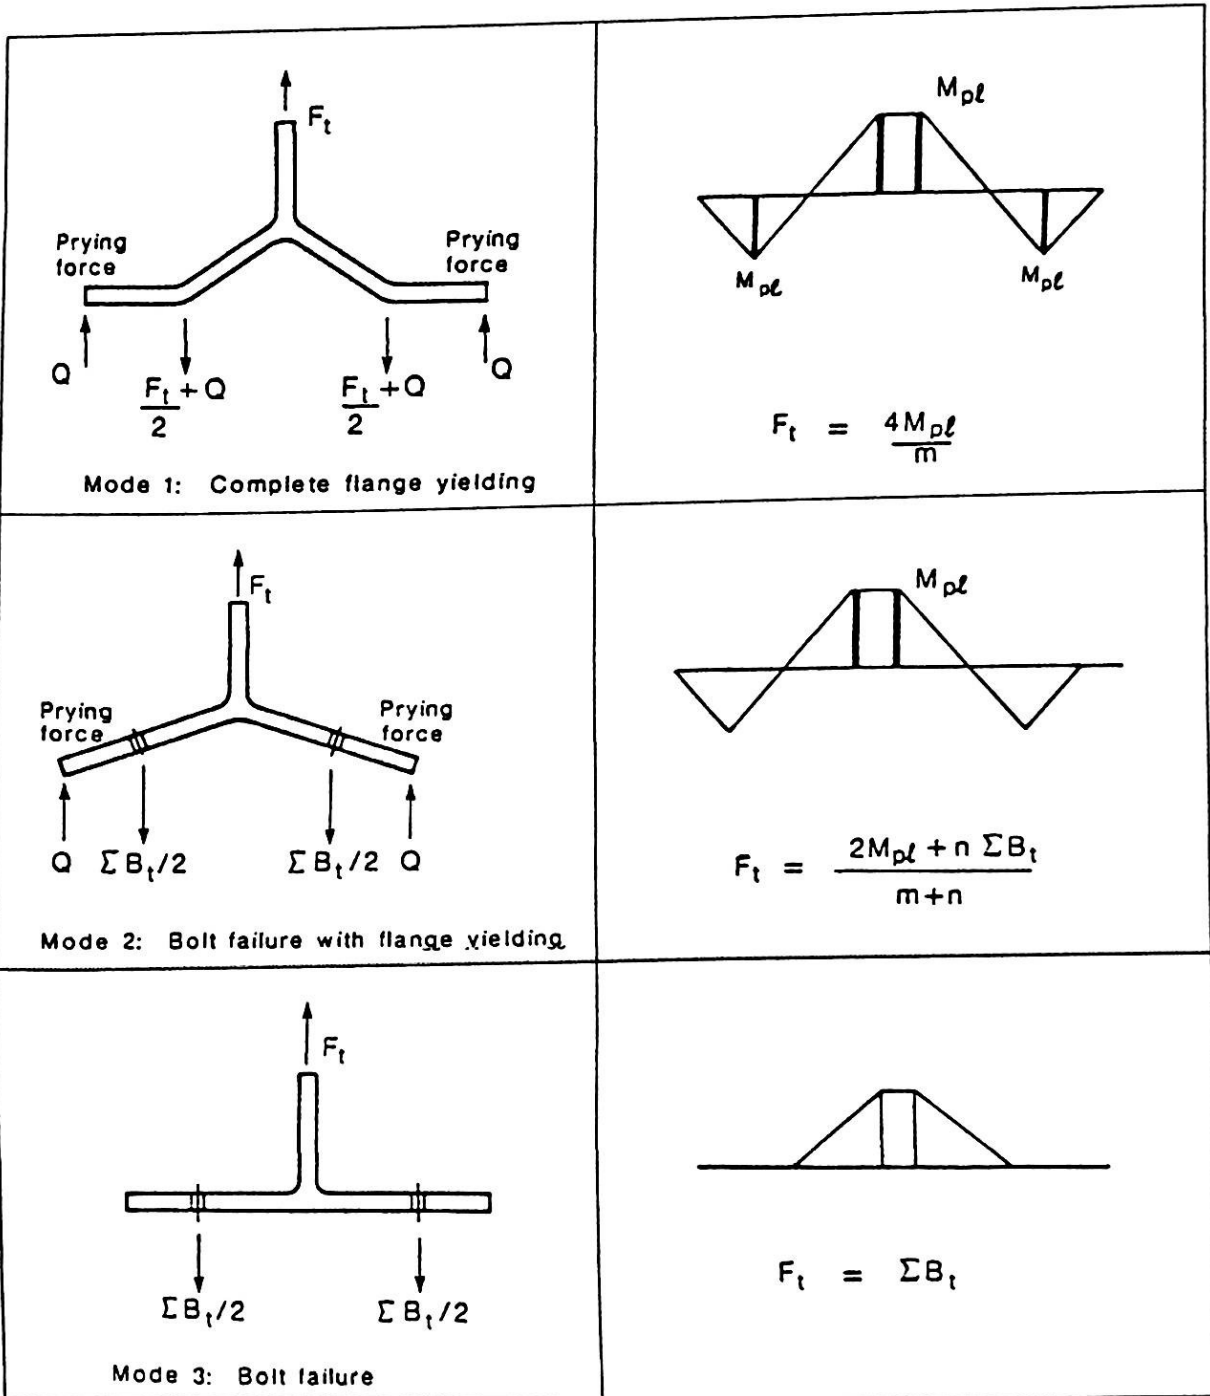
Failure modes of a T-stub flange
